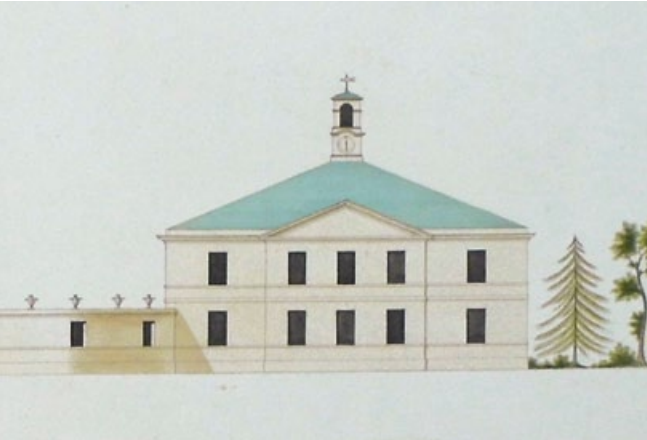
South elevation of unbuilt plans for Howick Hall by William Newton.
